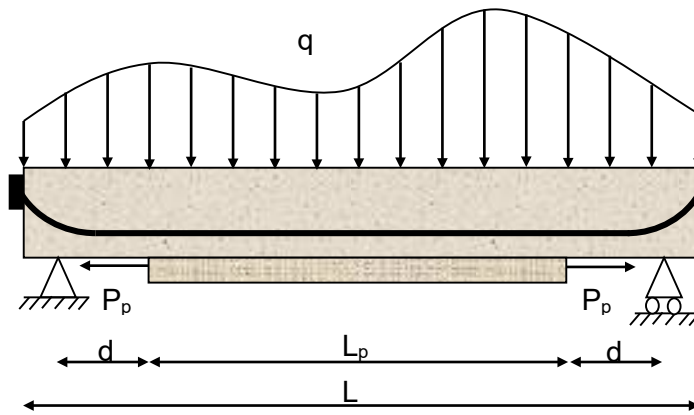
Simply supported prestressed concrete beam strengthened with a bonded FRP plate
